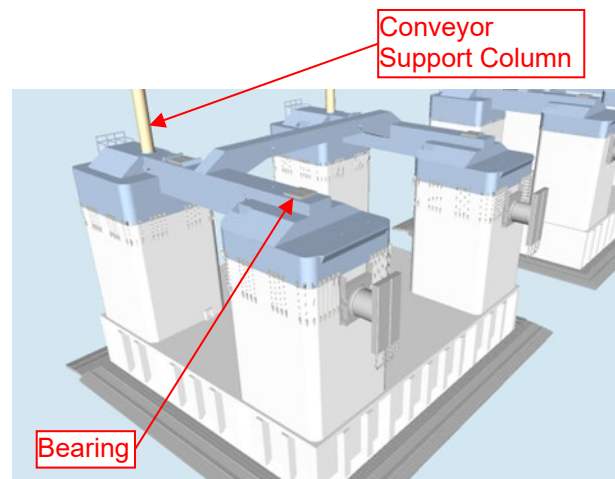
SDB (blue) and concrete berth caisson with deck omitted (Source: BMA)
